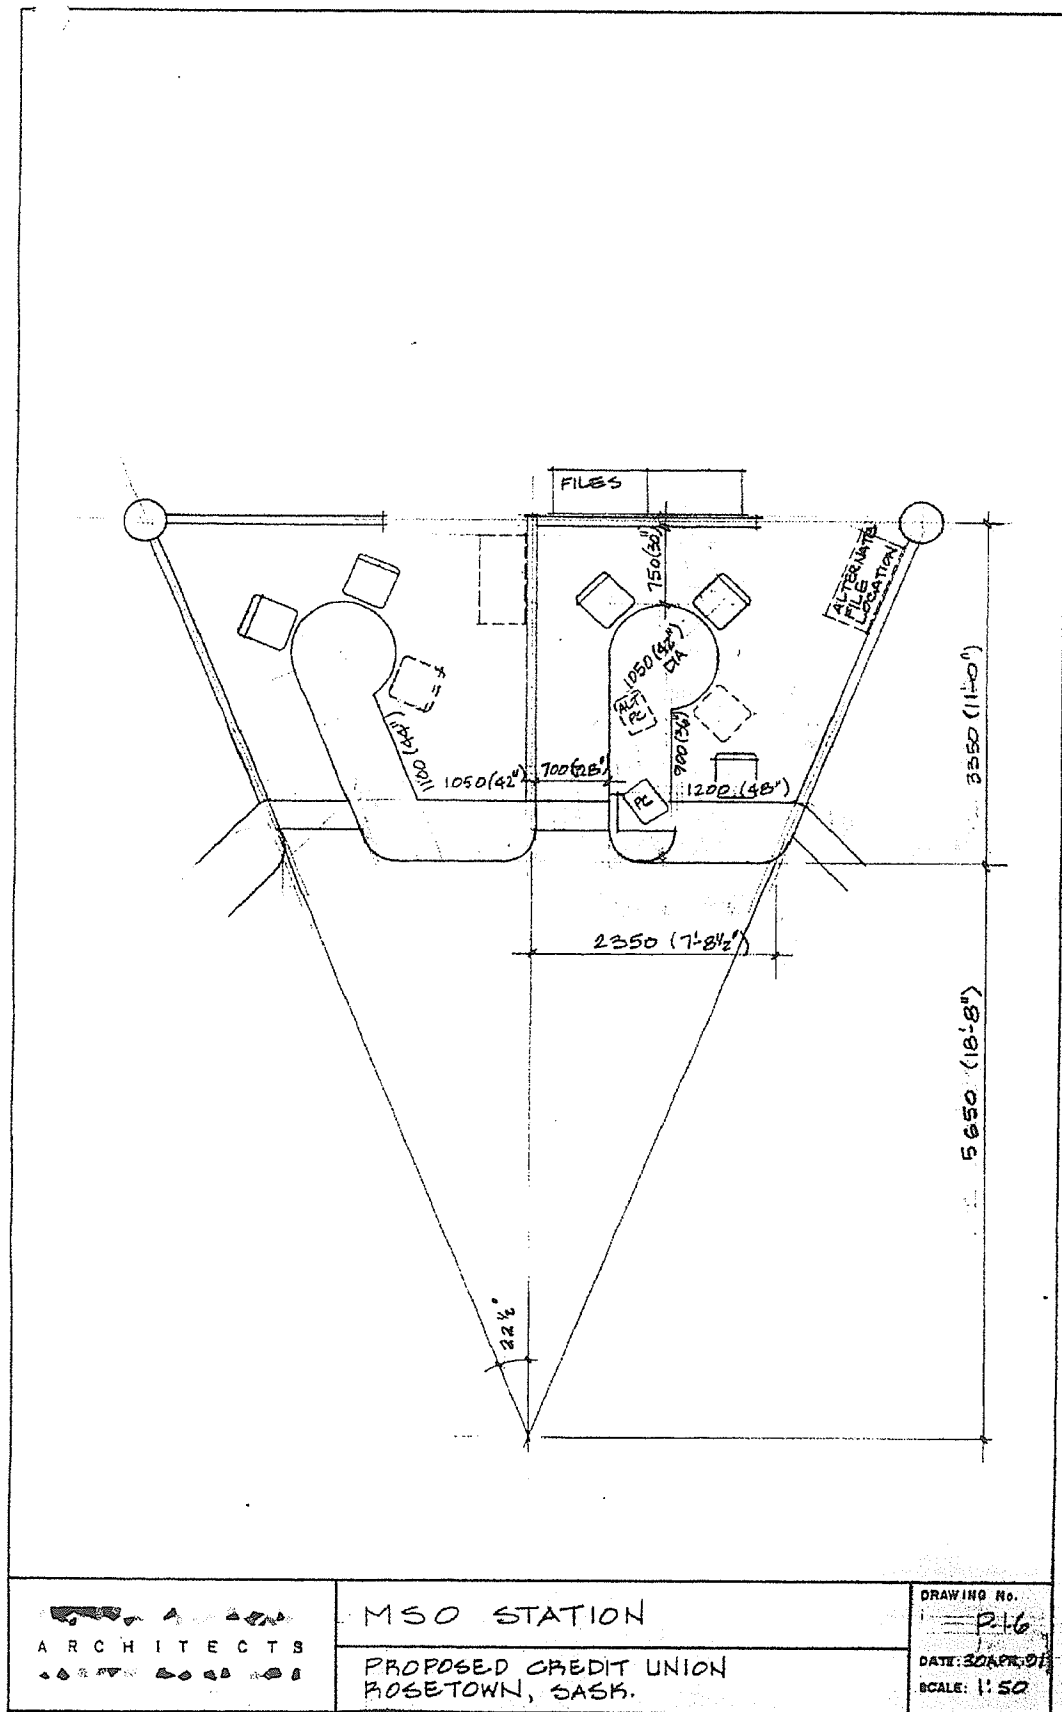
Architect design sketch 16, MSO Station. Courtesy of the architect.
